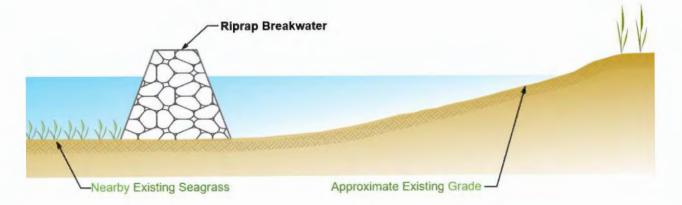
Conceptual section view of Alternative 1: riprap breakwater
